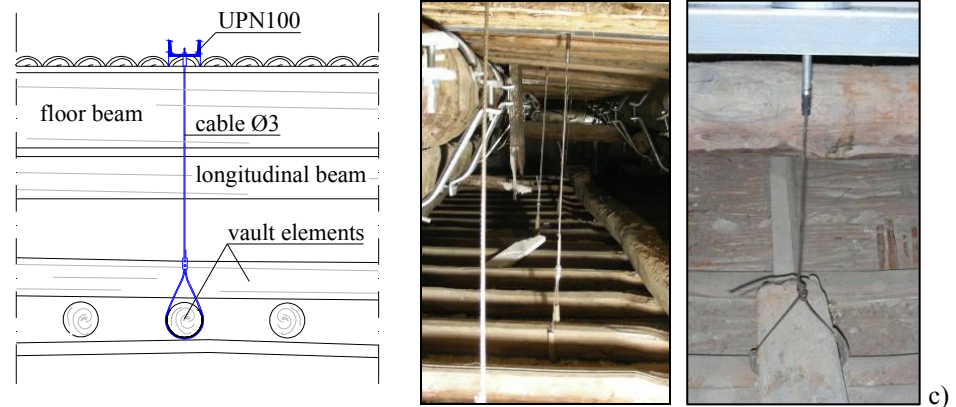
Diplomatic Hall (II) – Retrofitting interventions – Vault-floor connection:
